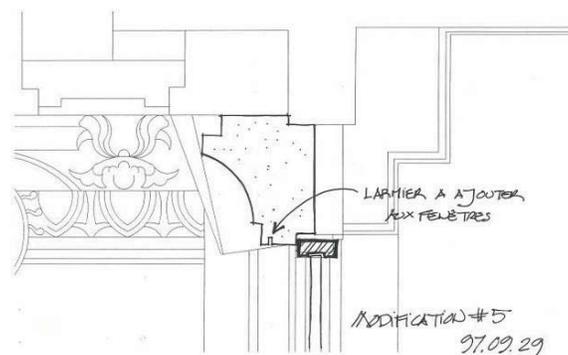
Sketch showing the saw cut to be made under the 5th floor window lintels.
